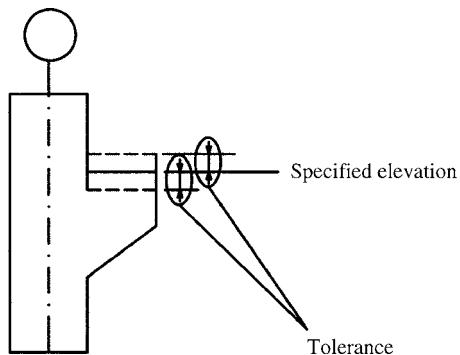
and R5.1.5—Individual corbels or continuous ledges: elevation view.
